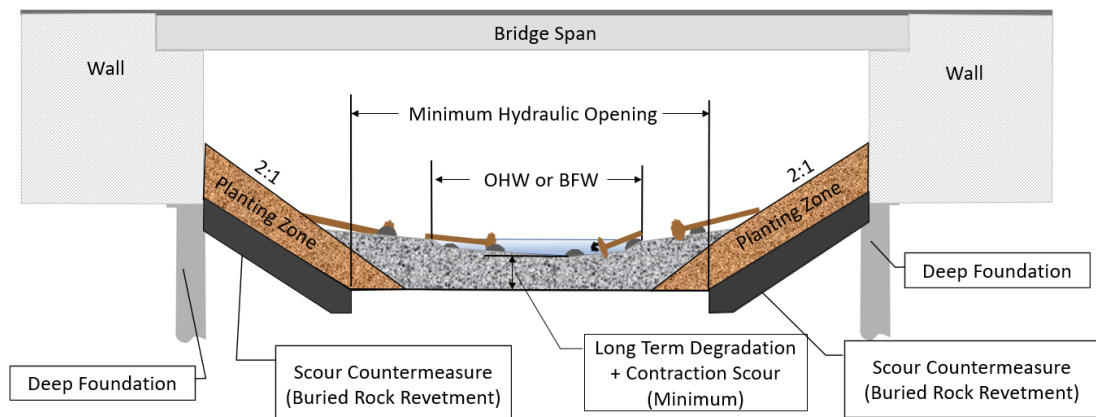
Scour Countermeasure Design for Water Crossing Structures with Deep Foundation and No Calculated Abutment Scour
